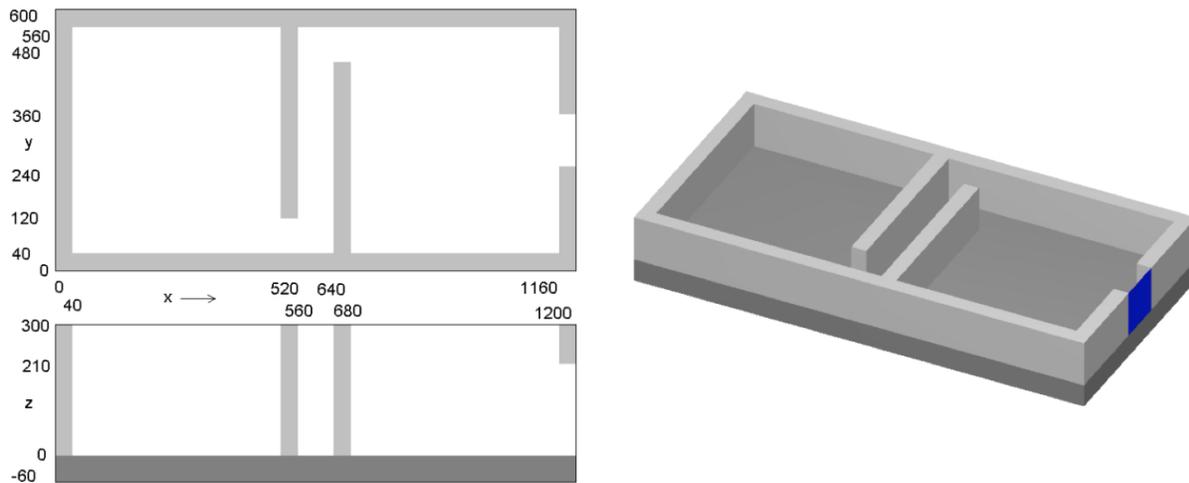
Coordinates of the floor, walls, ceiling, and door of the simple block building model (in cm).
